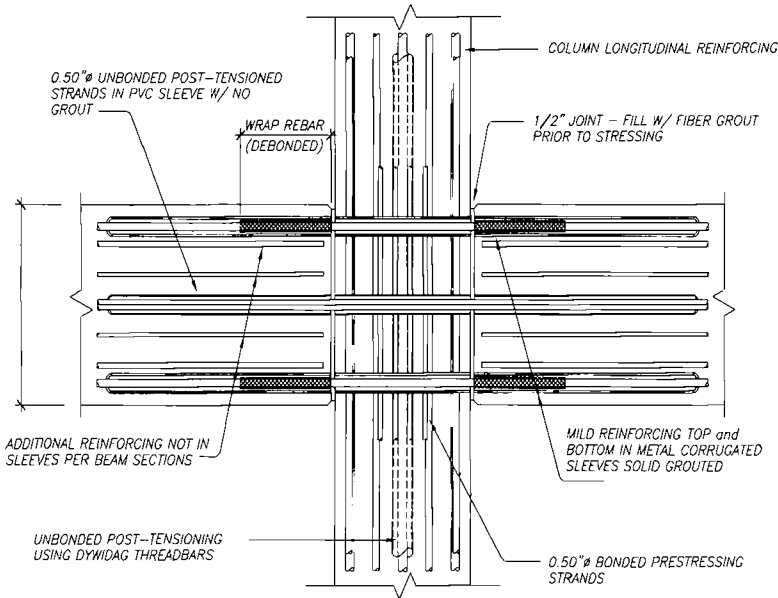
Hybrid Beam-to-Column Connection used in the UCSD 5-Storey Precast Building Test^[N1]
